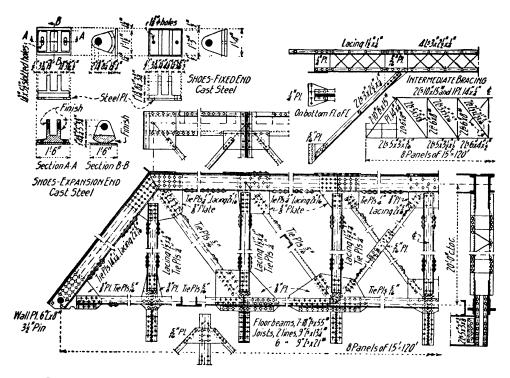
DETAIL PLANS OF THROUGH HIGH TRUSS SPAN. WISCONSIN HIGHWAY COMMISSION.
